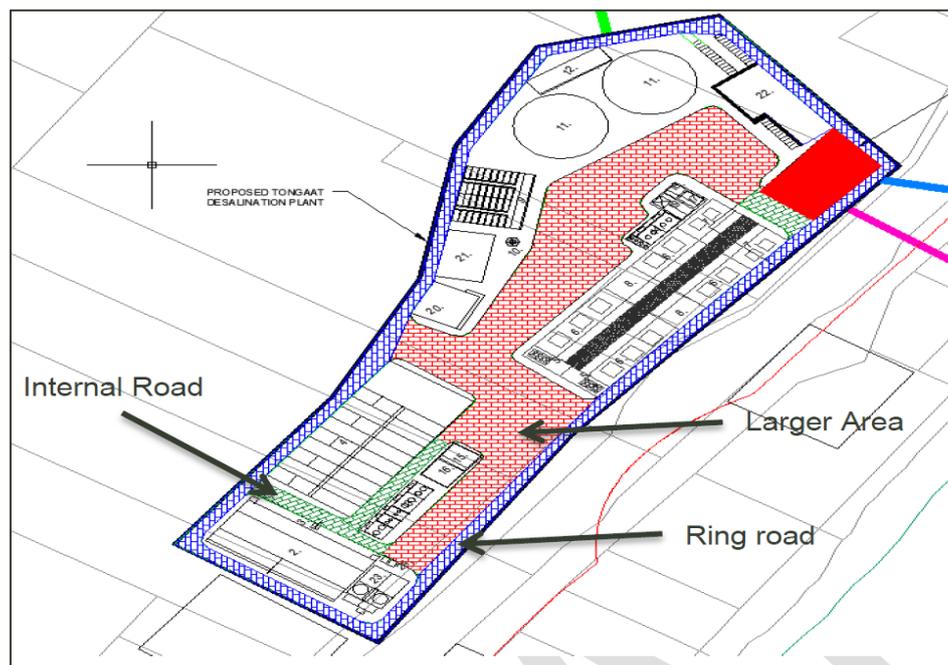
Proposed Internal Roads for the Tongaat Desalination Plant
